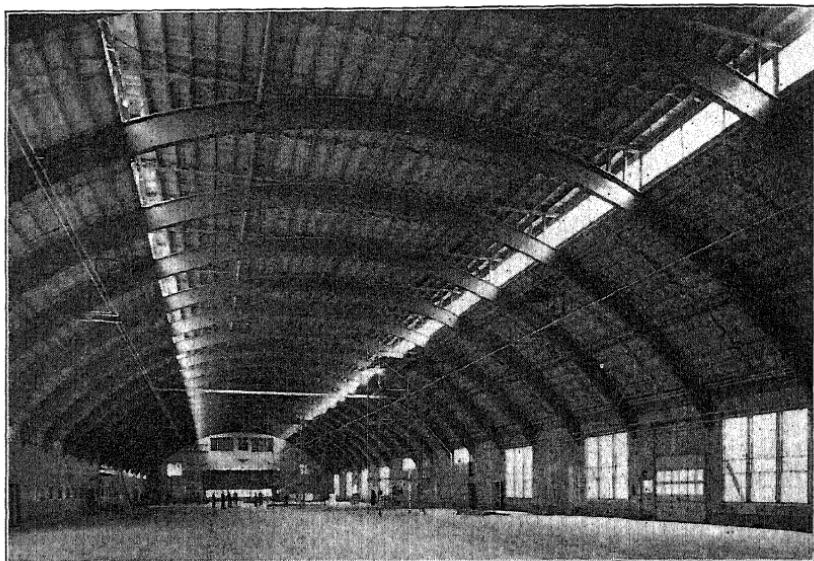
Laminated arches used in navy drill halls. Fabricated by Unit Structures, Inc., Peshtigo, Wisconsin.
